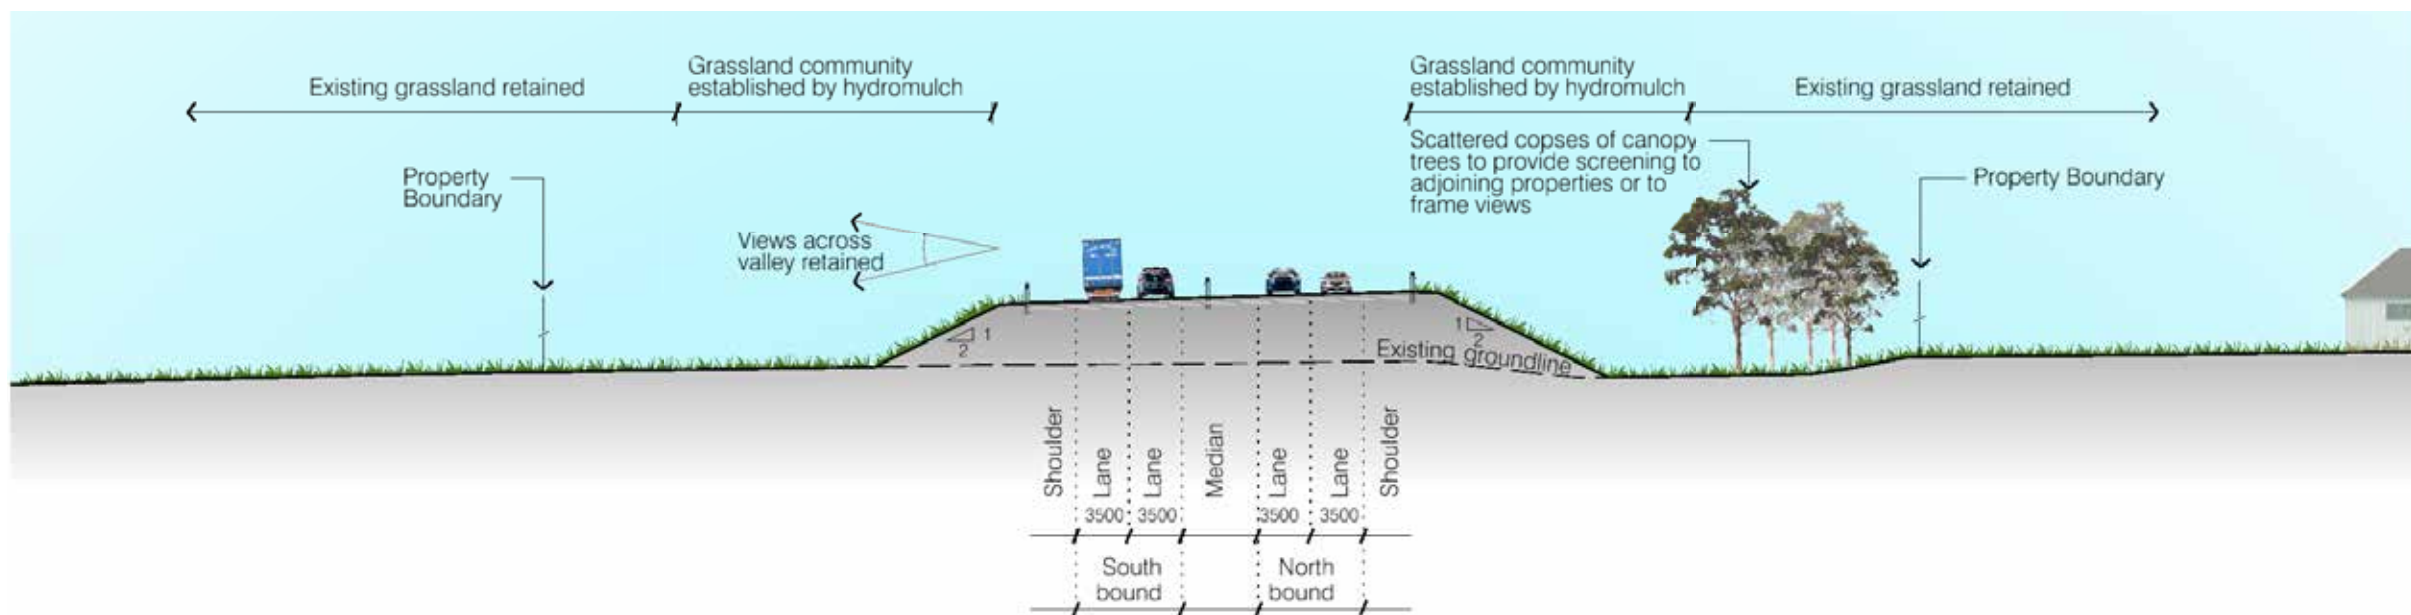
Road cross section at Ch. 10400 (Scale 1:500 @ A3)
